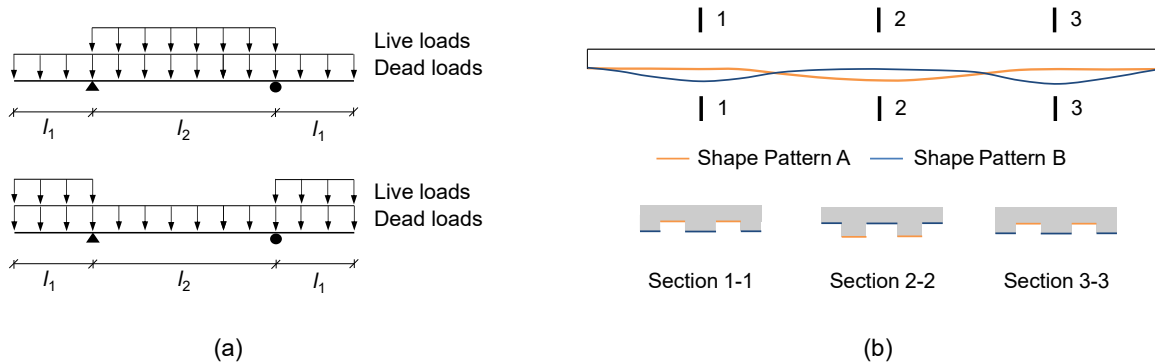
A simply supported non-prismatic slab (a: the most unfavourable distribution of load for the mid-span section and the section at the supports, respectively; b: the conceptual design of the non-prismatic slab with Shape Patterns A and B alternating in the transverse direction)
